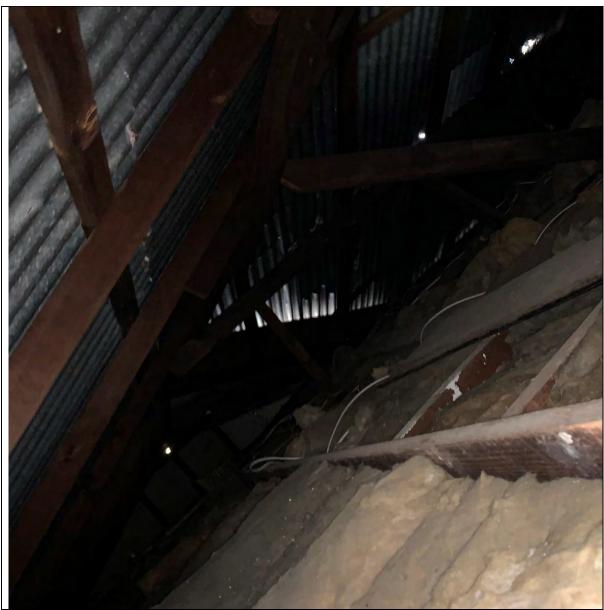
View of the attic space from the bathroom (Room 3). The attic contains insulation composed of synthetic mineral fibre.
